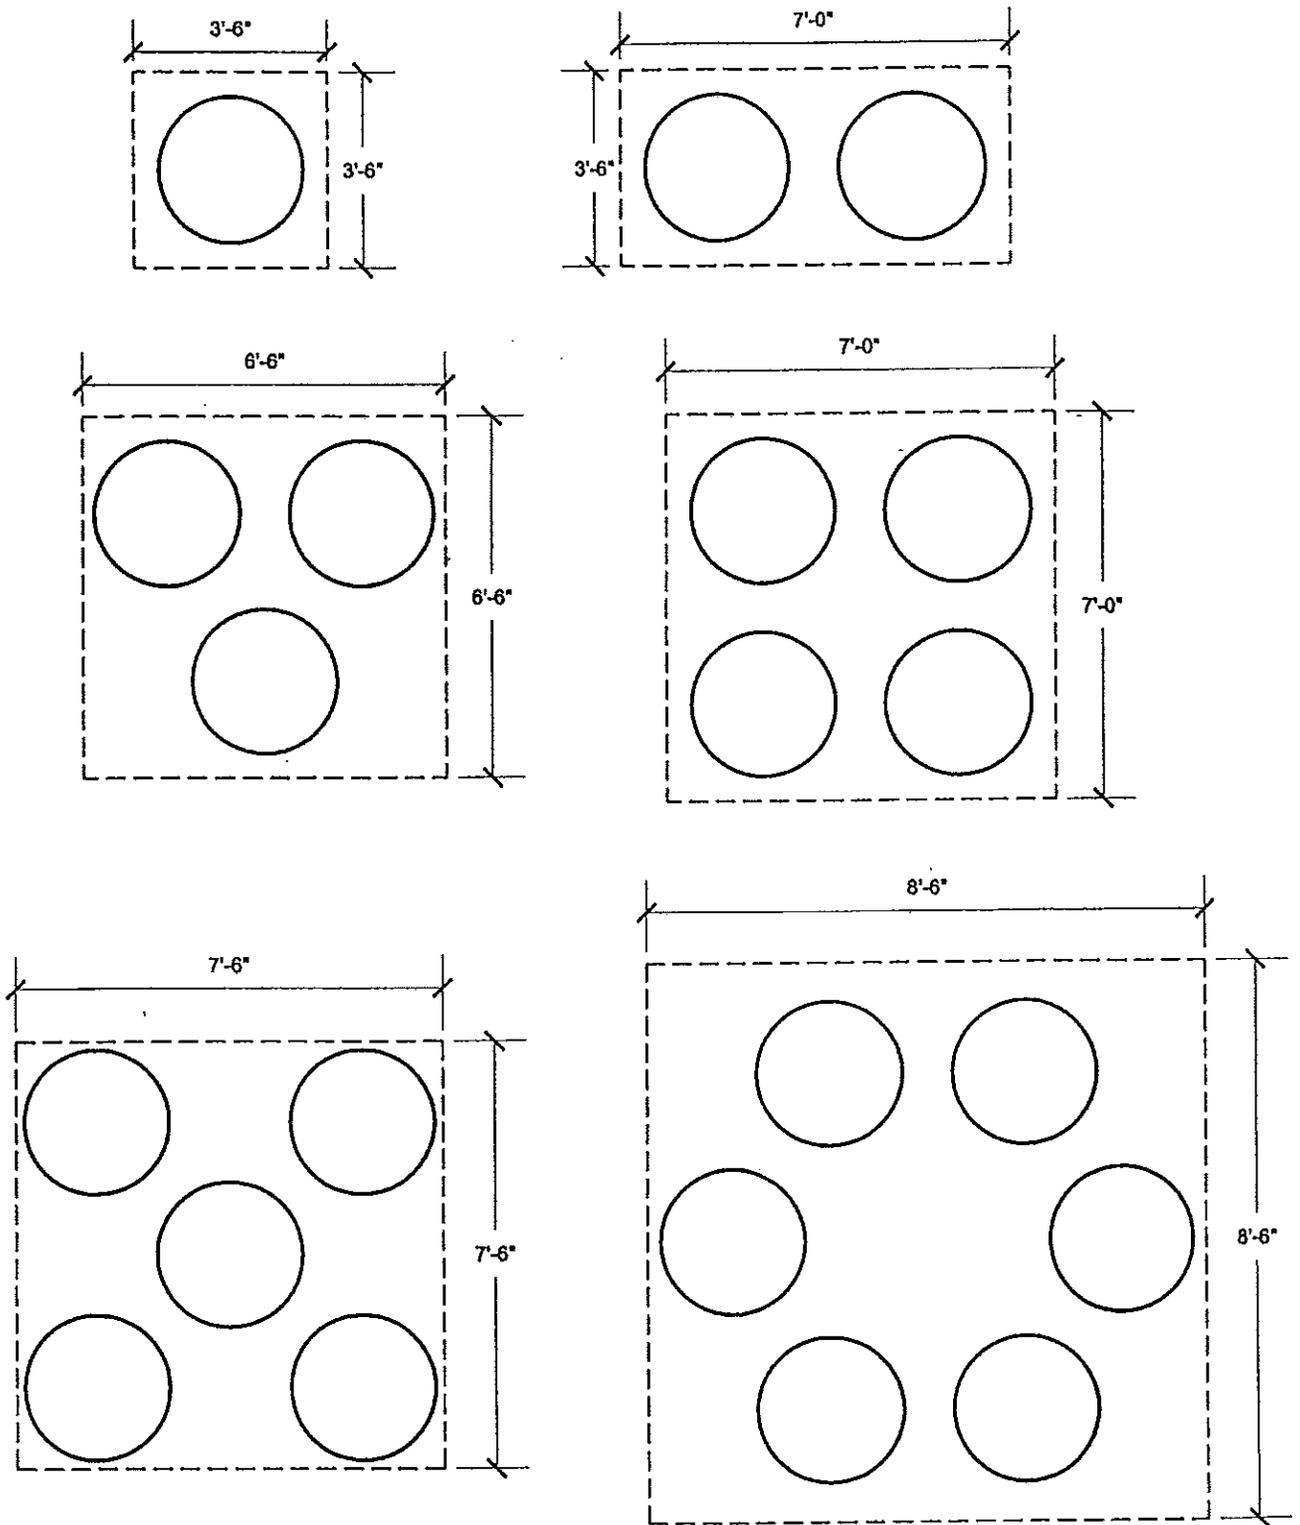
Typical 30" Dia. Geopier Element Layouts for Selected Footings
